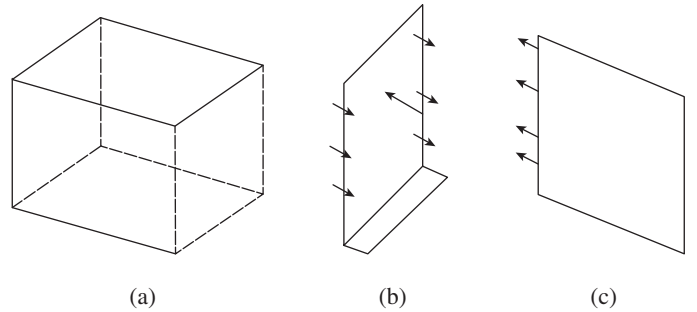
Tank walls subjected to bending moment and axial tension (a) Rectangular tank (b) Side wall (c) Front and back wall
